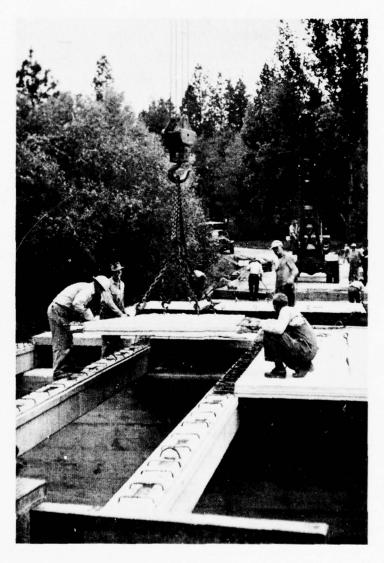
Erection of a bridge of precast beams and slabs (courtesy of Portland Cement Association)
